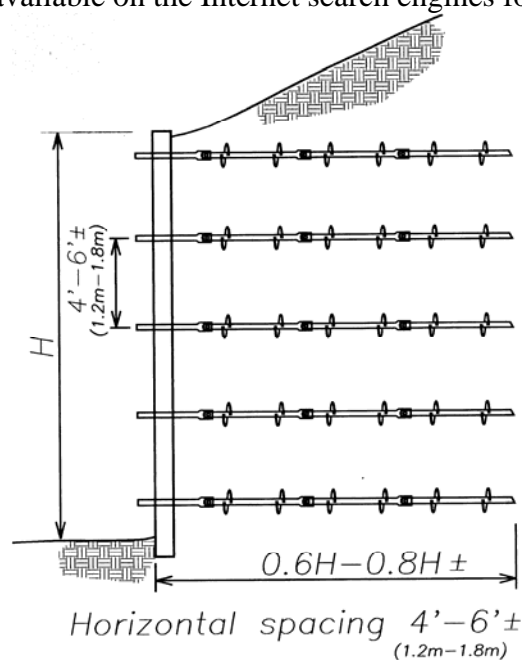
Cross-section of Helical Soil Nail Wall with Typical Dimensions
